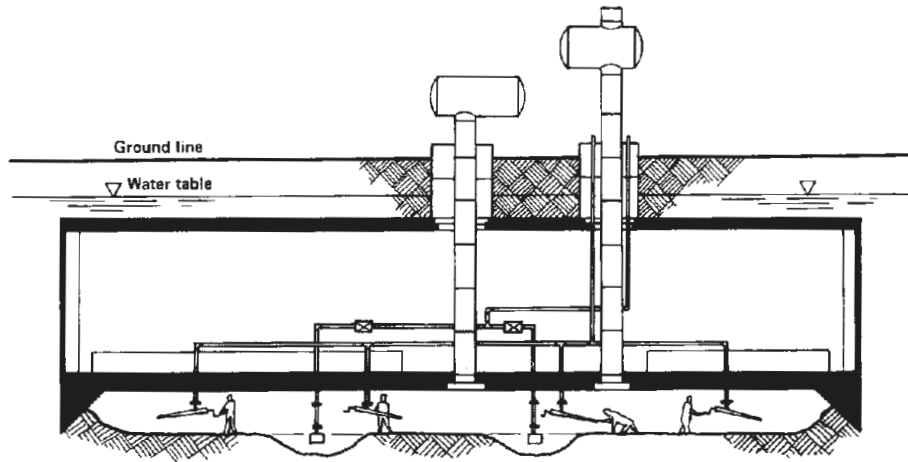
Longitudinal section (schematic) of "sunken tube" section on the Amsterdam Metro. (Courtesy Civil Engineering magazine)
